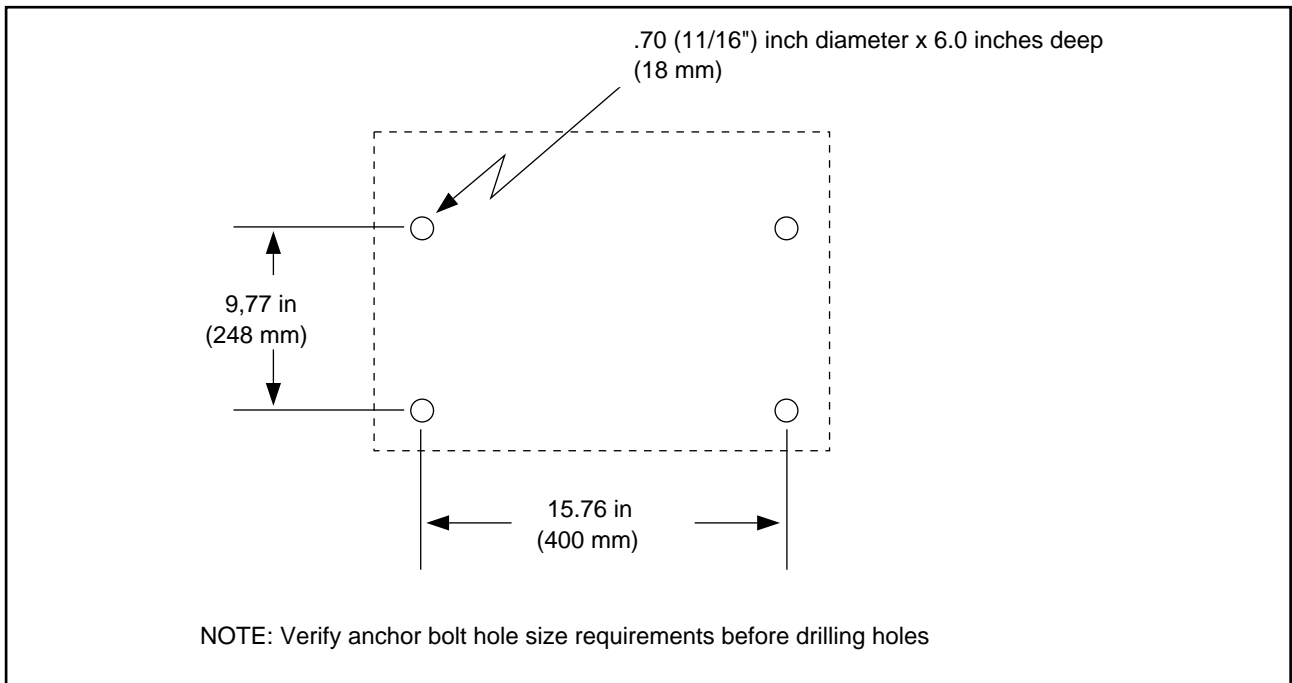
Anchor Bolt Spacing for RBS Pico Equipment Base
